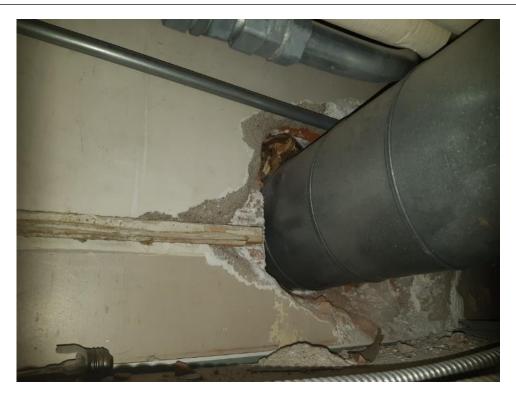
Basement, main hallway, 80 square metres poor condition wall plaster at pipe/duct wall penetrations.
